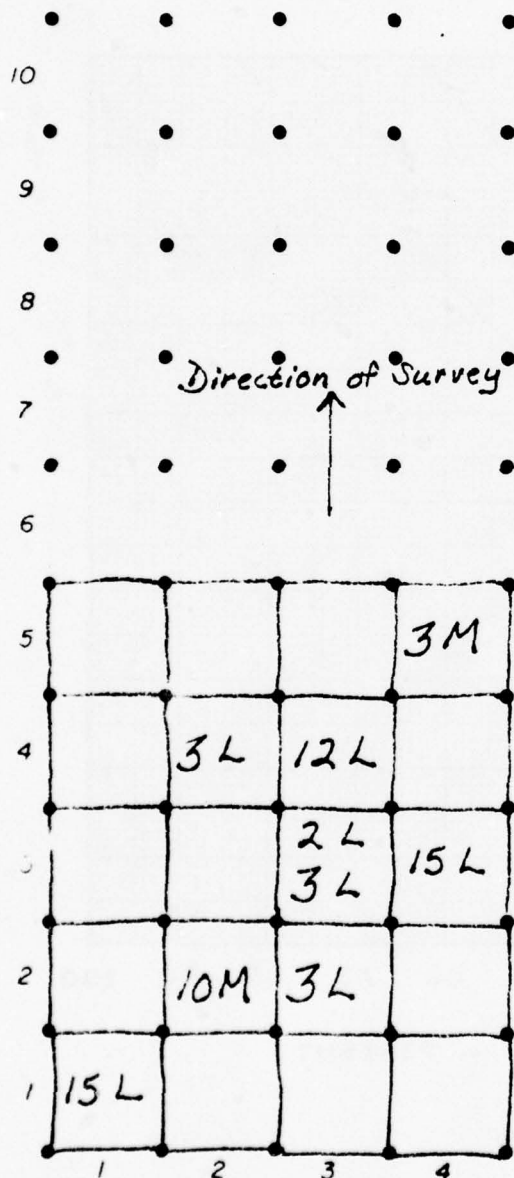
Illustration of Division of a Jointed Concrete Pavement Feature Into Sample Units of 20 Slabs.
